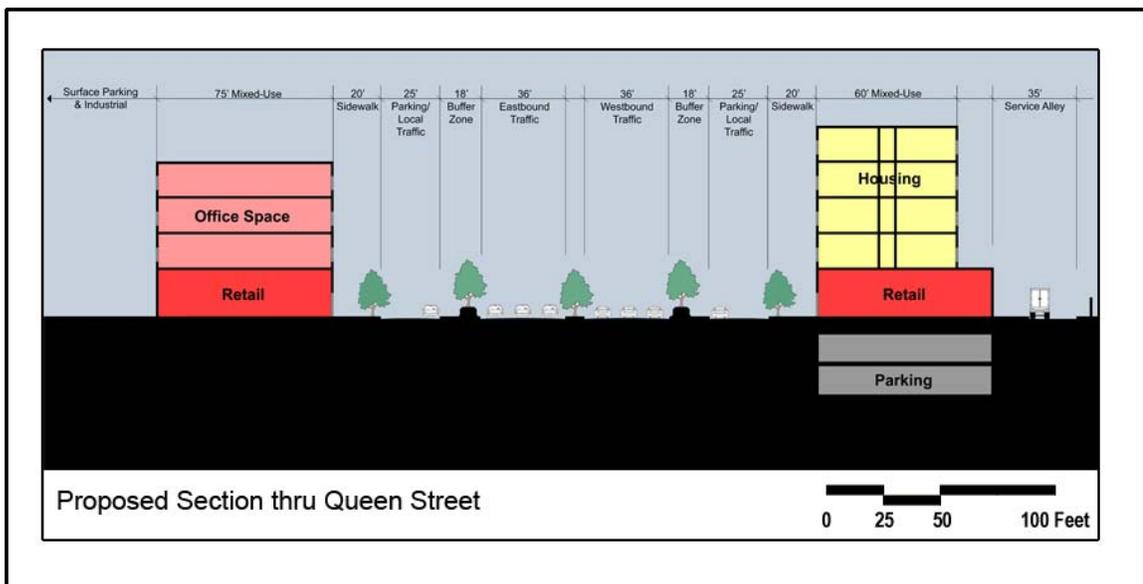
Proposed Street Section, Brampton, Ontario, Canada
